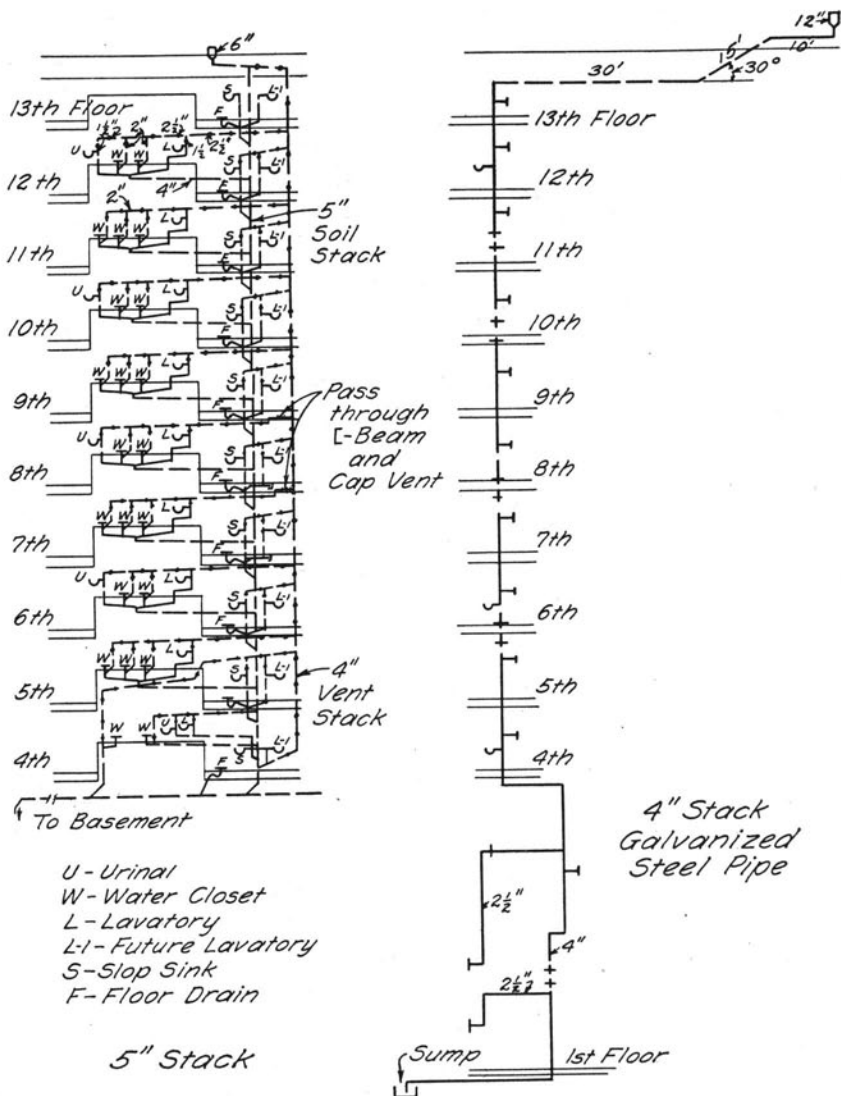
PIPING CONNECTIONS TO 5-IN. AND 4-IN. STACK IN RIDGLEY FARMERS STATE BANK BUILDING
